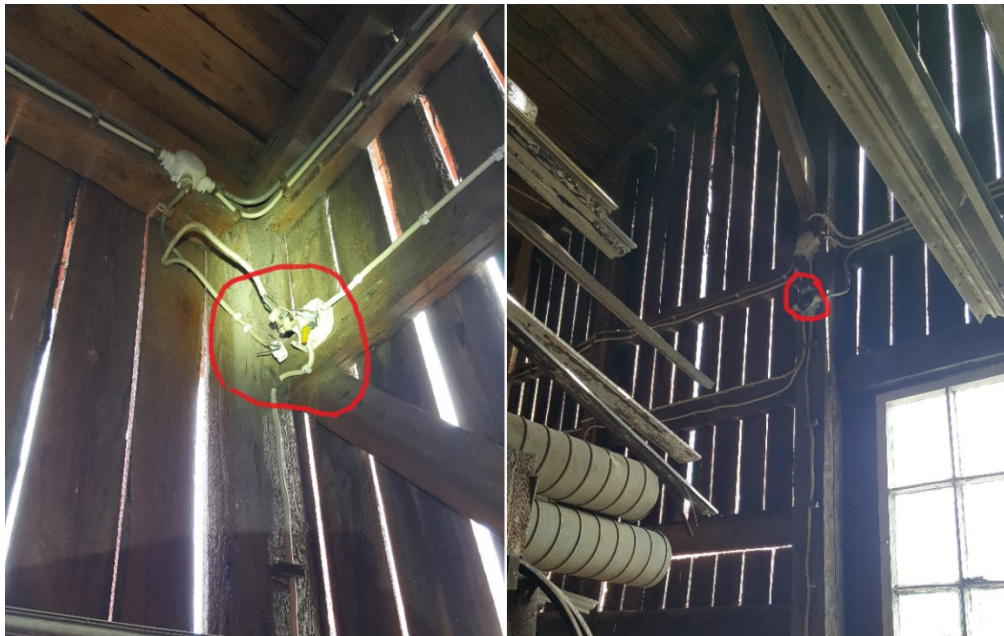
room F Open ended cable & 38 room F worn main cable between buildings.
